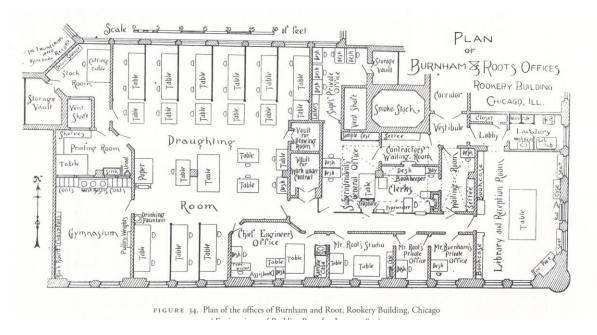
Office Plan of Burnham and Root in Rookery Building, ca. 1890.
